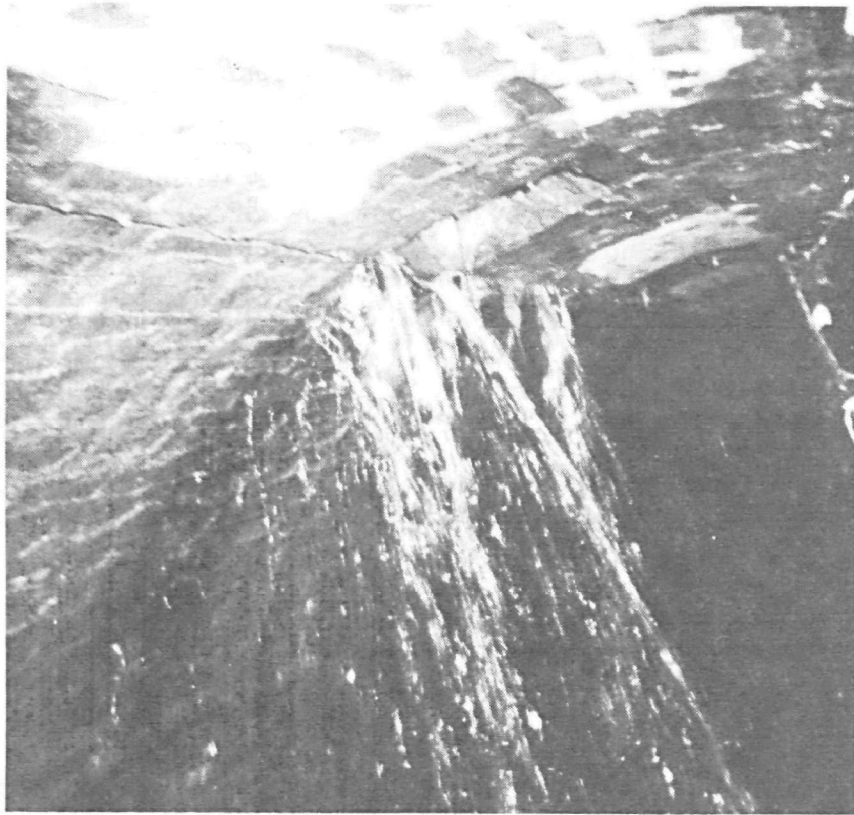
Sewer Infiltration from Broken Brick Arch Section
